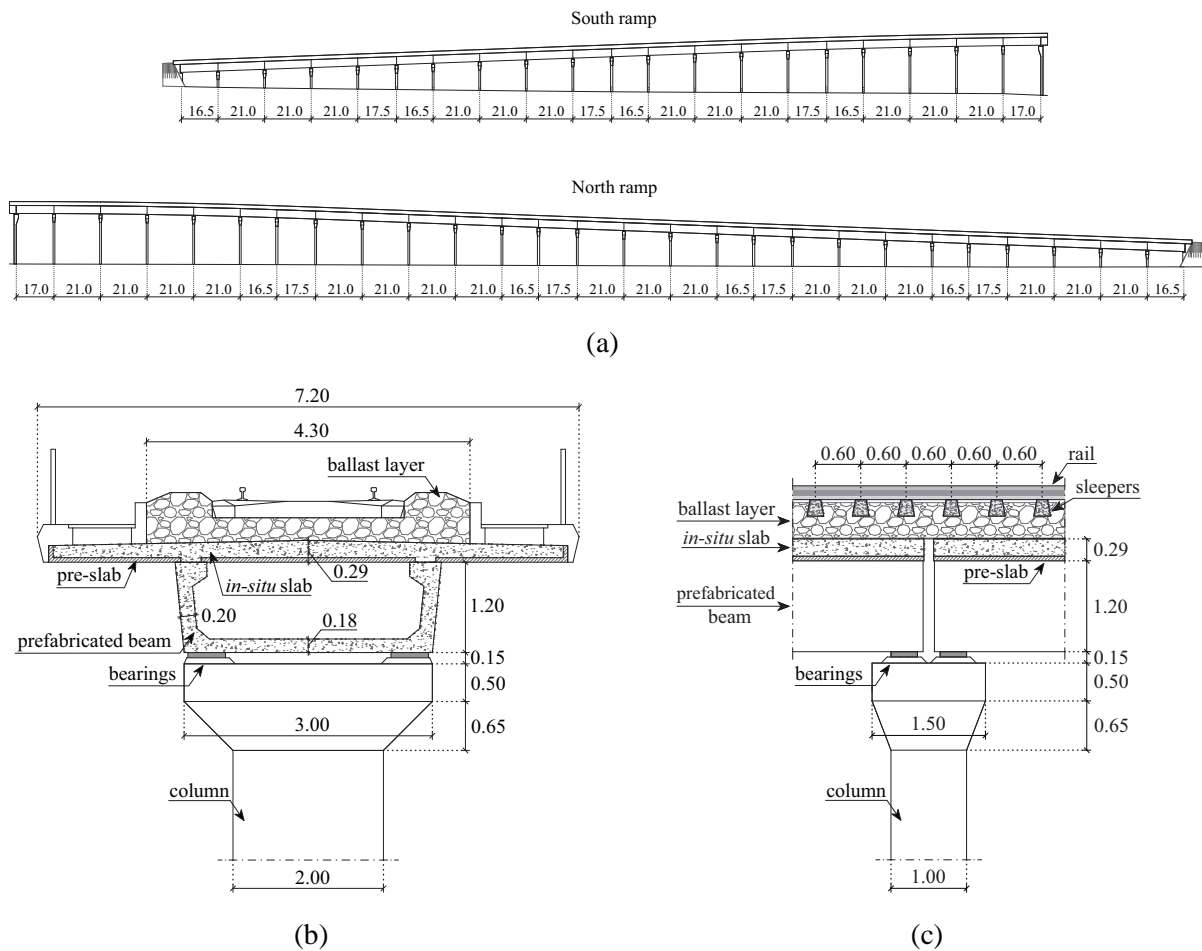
Blueprints of the Alverca viaduct: (a) elevation view of the South and North ramps; (b) cross-section and (c) deck joint above the pier.
